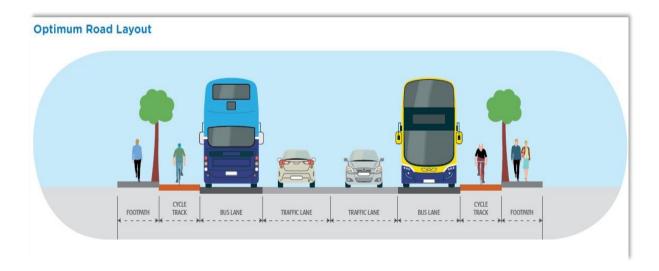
Typical Swords Road Cross Section adjacent Site
